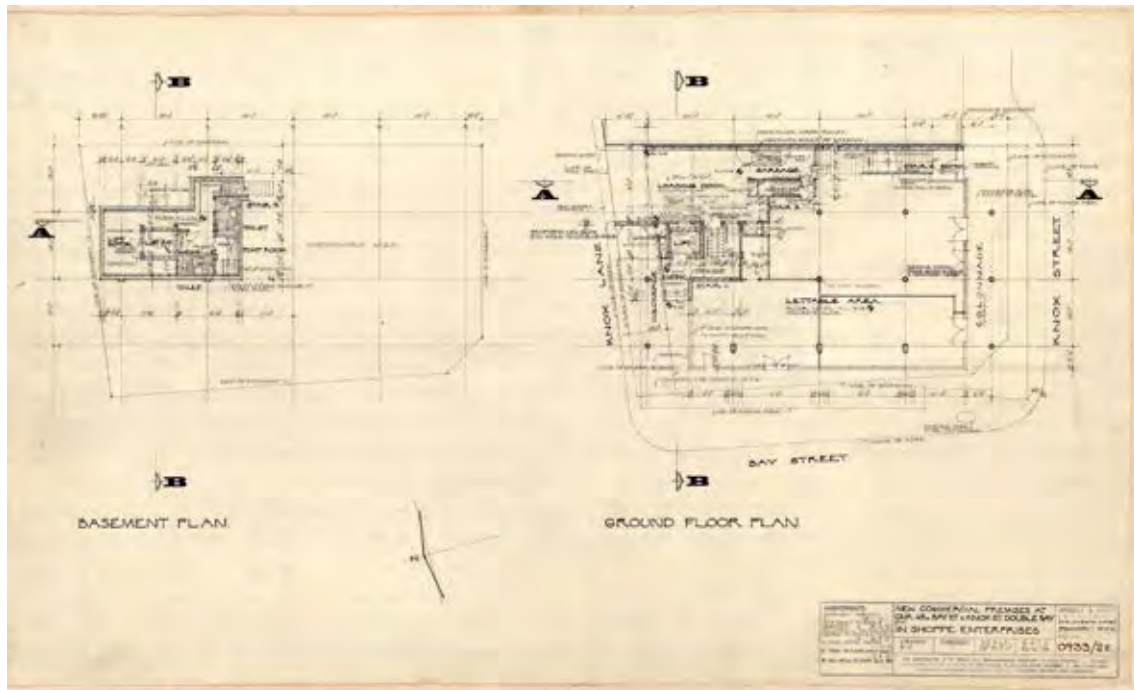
| The reduced basement and the ground floor plan of the Gergely & Pinter revisions, which formed the contract documents for construction. The entrance to the building was changed and the service areas were altered. (Source: Gergely & Pinter)
